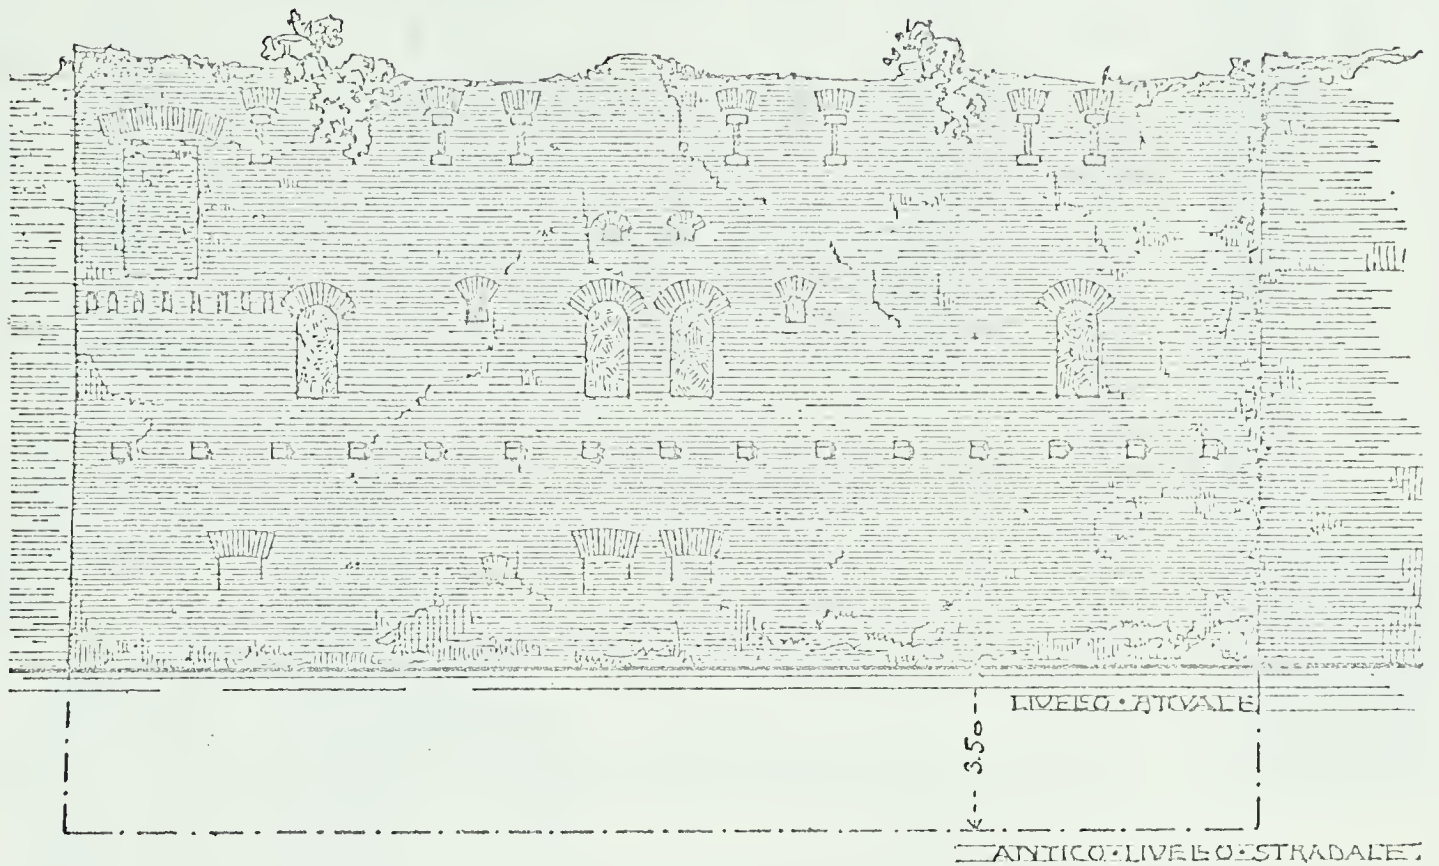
Facade of a Roman insula incorporated into the Aurelian wall, north of the Porta Tiburtina.
